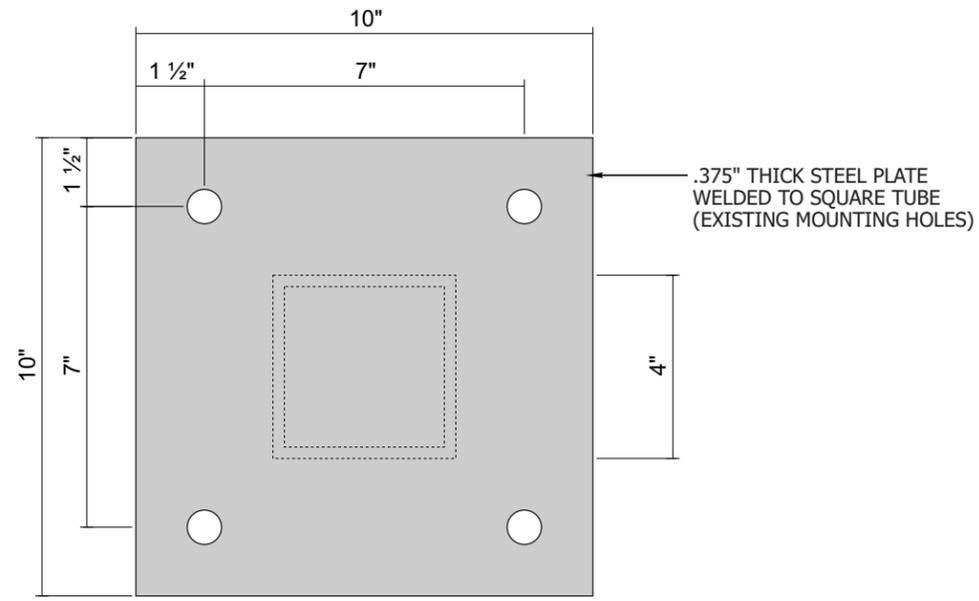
PLATE MOUNT SECTION - TO BUILDING SCALE: 3" = 1'-0"
